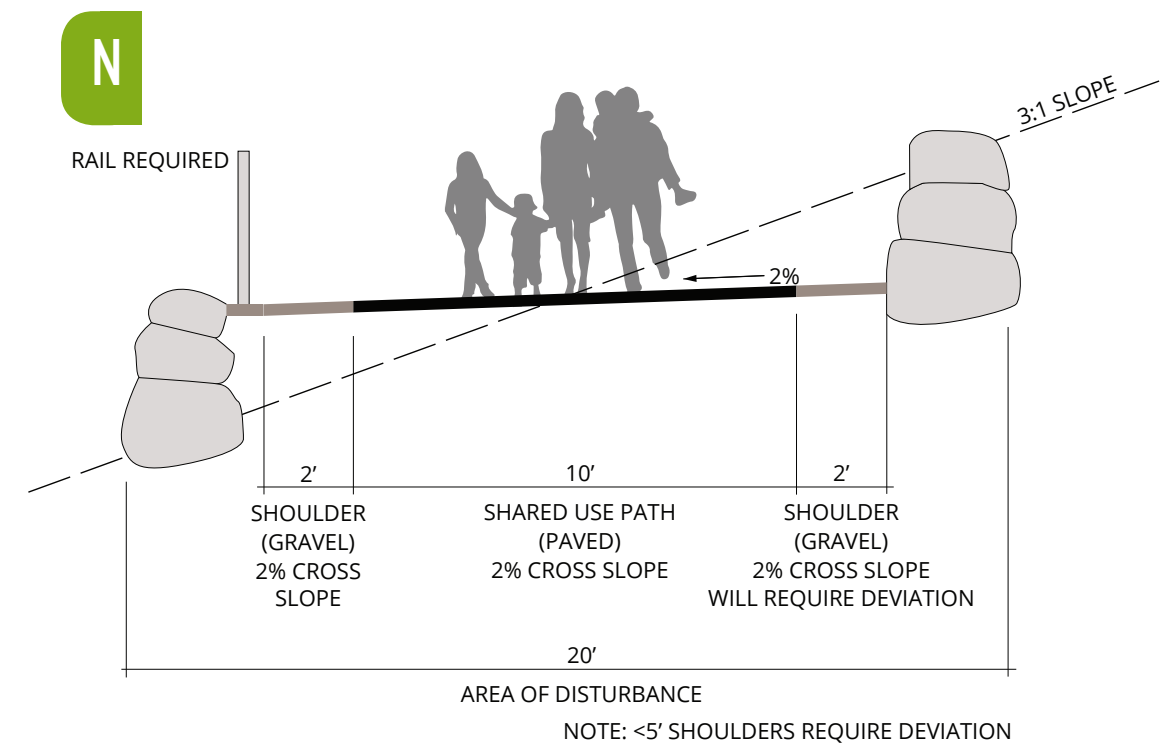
N: Trail Type F - Typical on 3:1 Cross-slope with Walls
